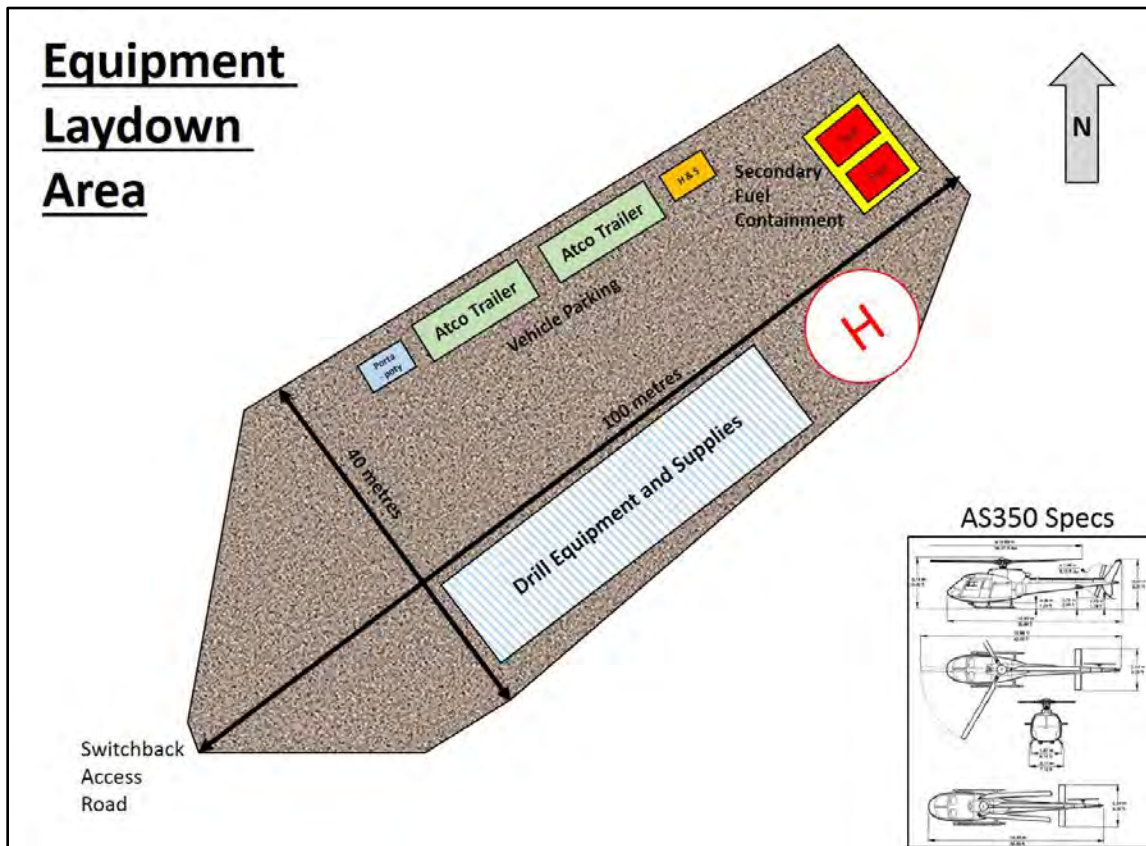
Detailed Plan View of Equipment Laydown Area
